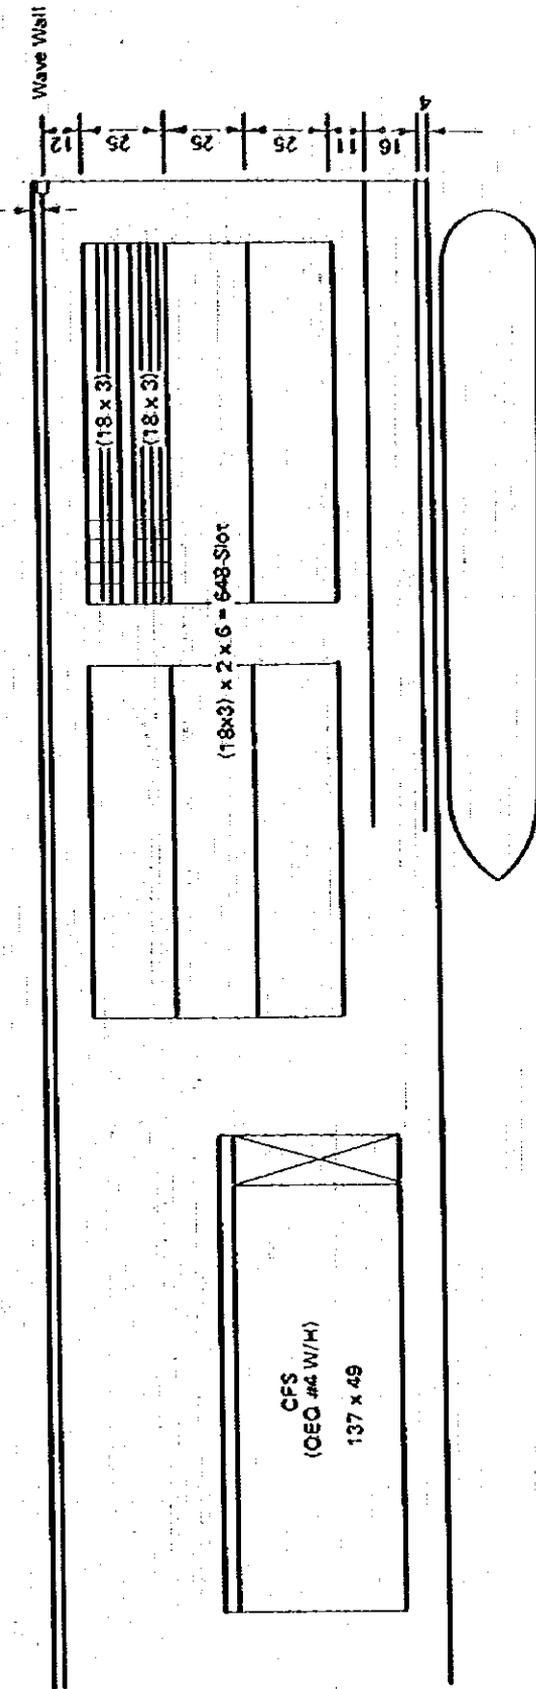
Layout of QEQ #5 Container Terminal (Sideloader System)
